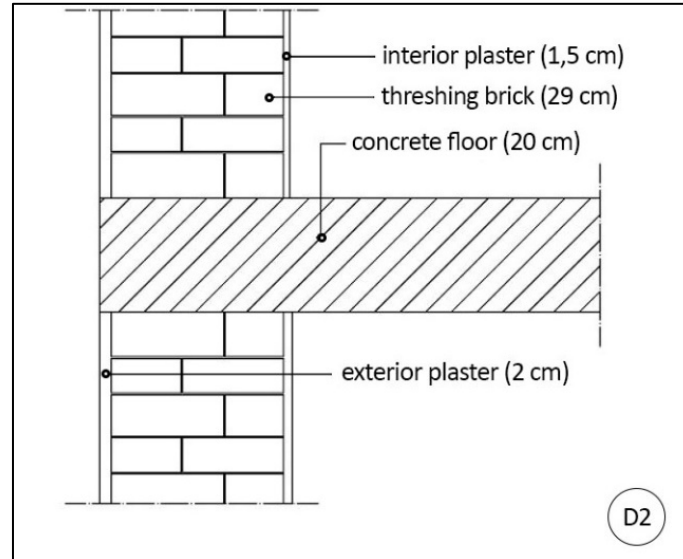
Brick masonry wall and flooring detail (produced by the authors)
